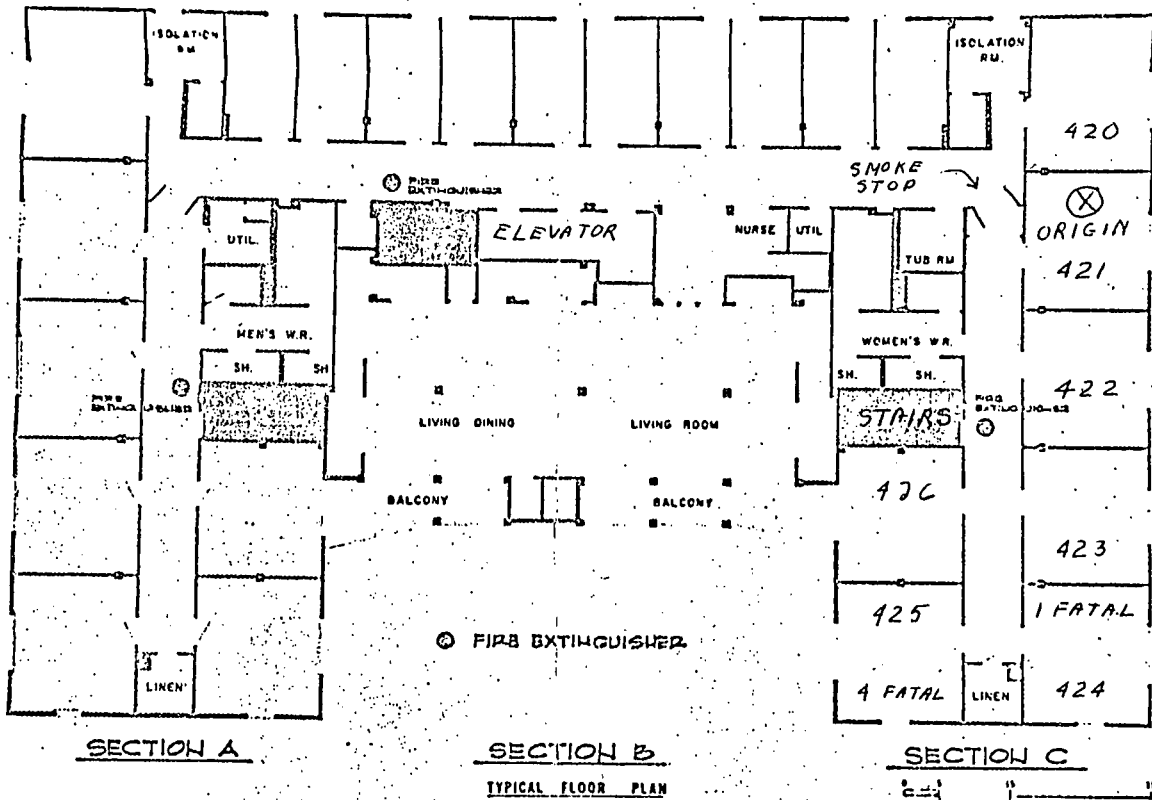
Fourth Floor Plan of Cermak House Nursing Home
